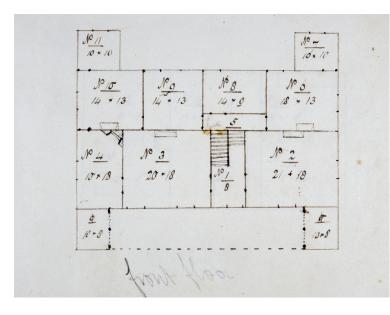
Plan of the 'middle' floor of the rear elevation, with the front of the house at the bottom. Front entrance hall is number 1, with stairways leading up to the mezzanine hosting rooms 6-11. Rooms 2, 3 and 4 are entertaining rooms, with an *enfilade* arrangement of doors linking them. Meredith's own bedroom was number 6.
